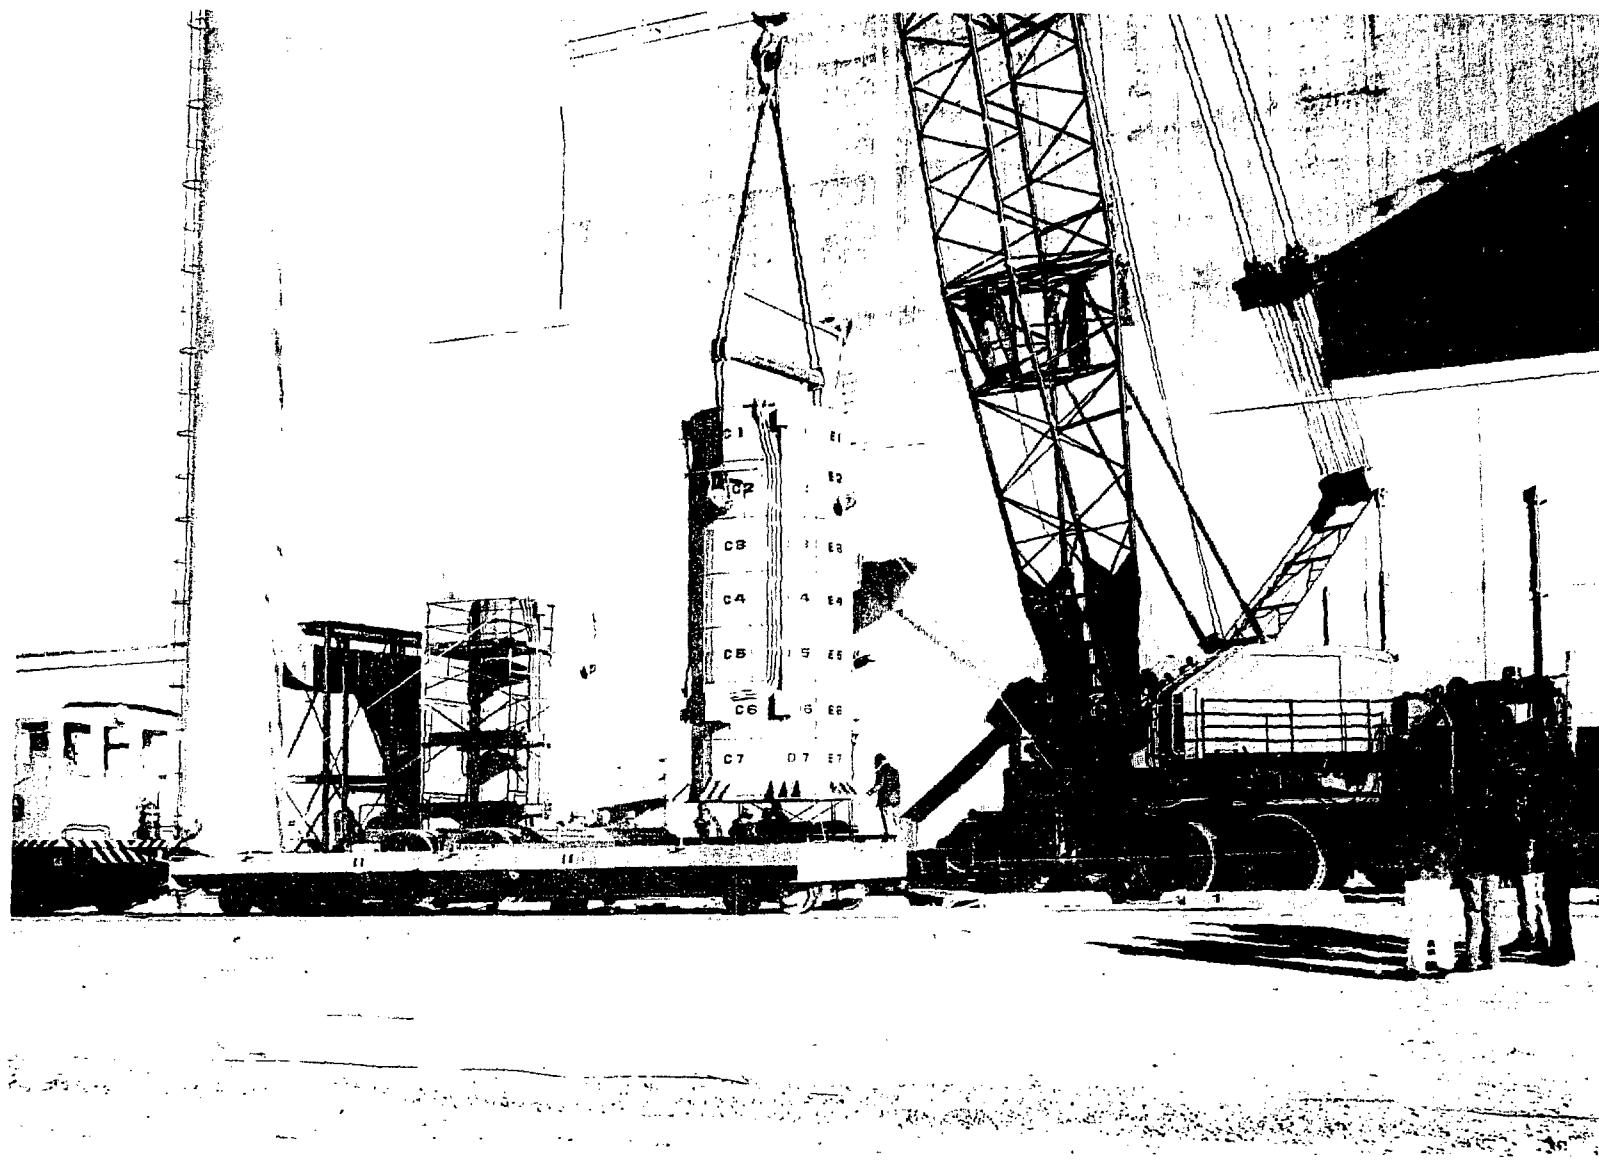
Sealed Storage Cask Containing Canister Package Being Lifted by Mobile Crane for Final Emplacement.
